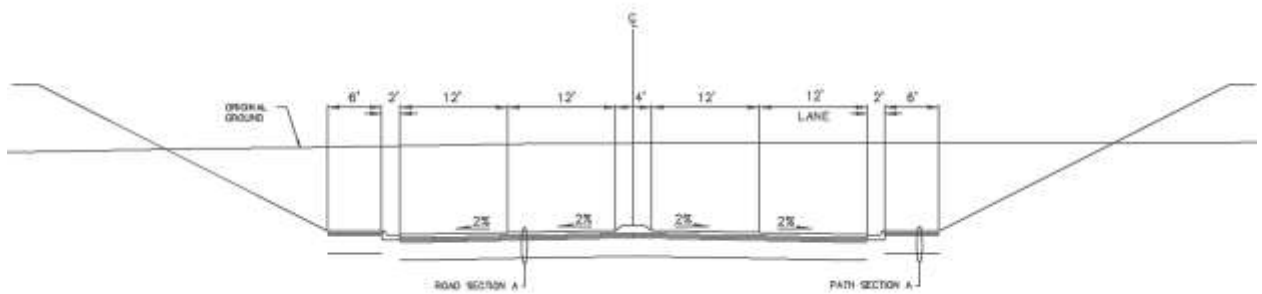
92nd Avenue Bridge Area (STA. 13+50 TO STA. 17+50)
